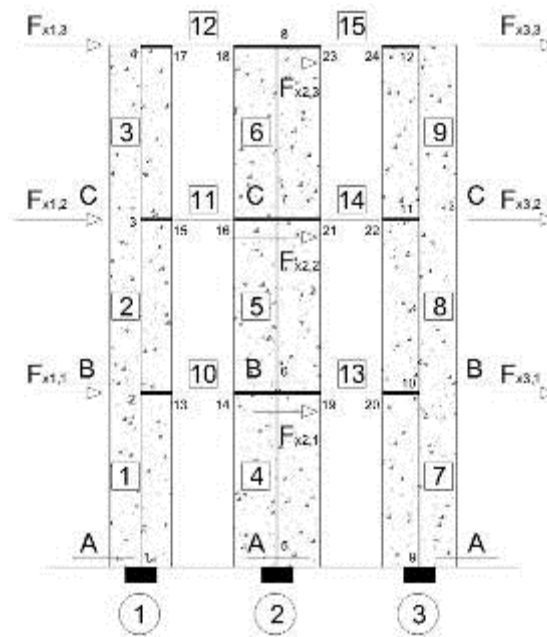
Wall model with transverse of nothing flexural stiffness and no floor beams.
